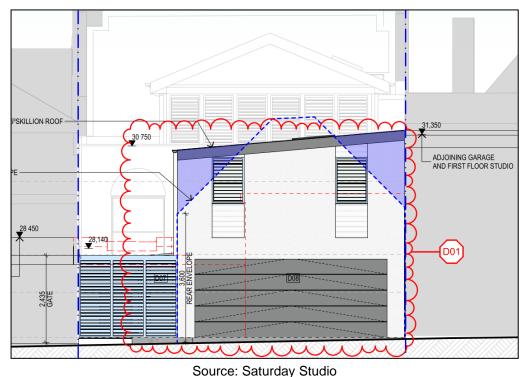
Proposed Laneway Elevation (areas breaching the inclined plan shown in blue)
